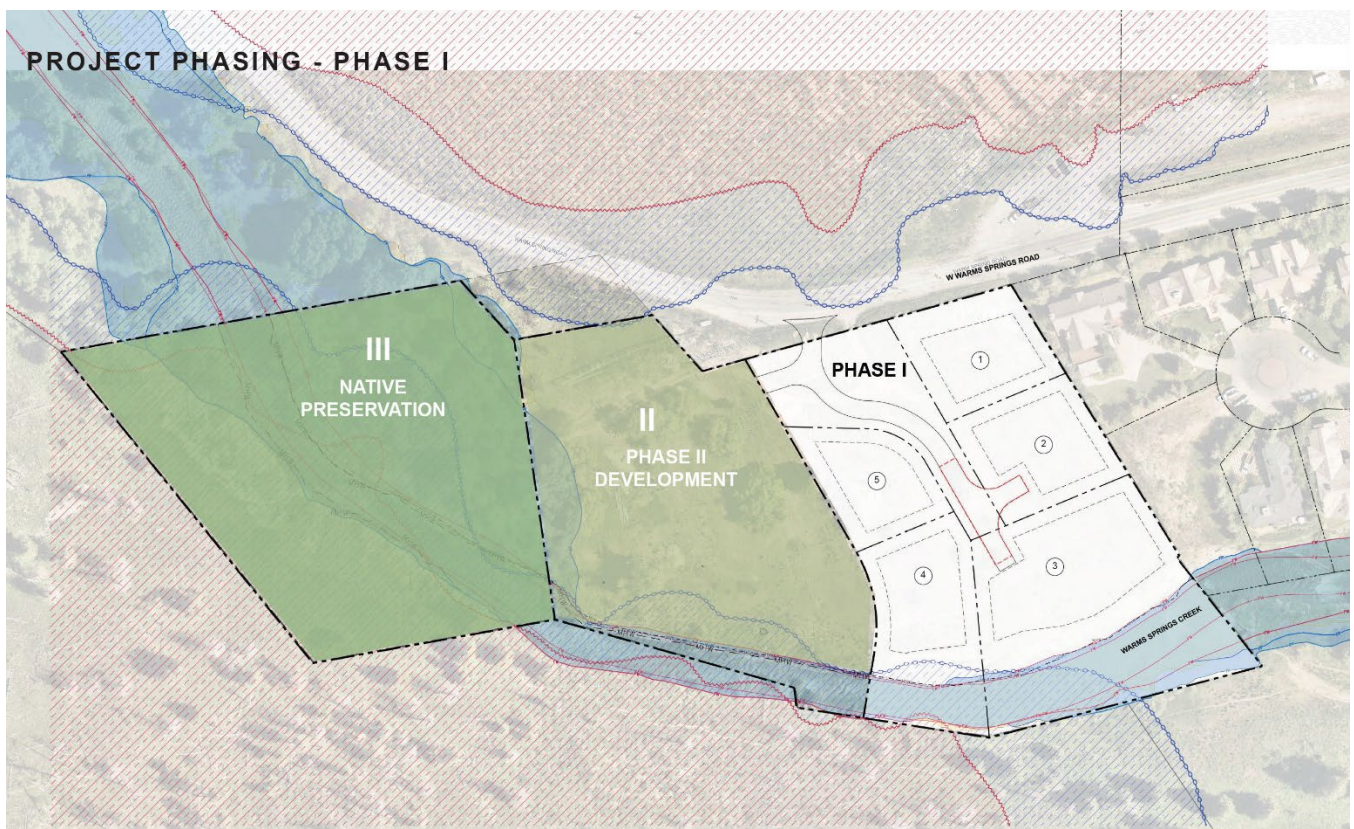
Guyer Hot Springs Subdivision, Phase I – Block 1 – Detail Plan.
